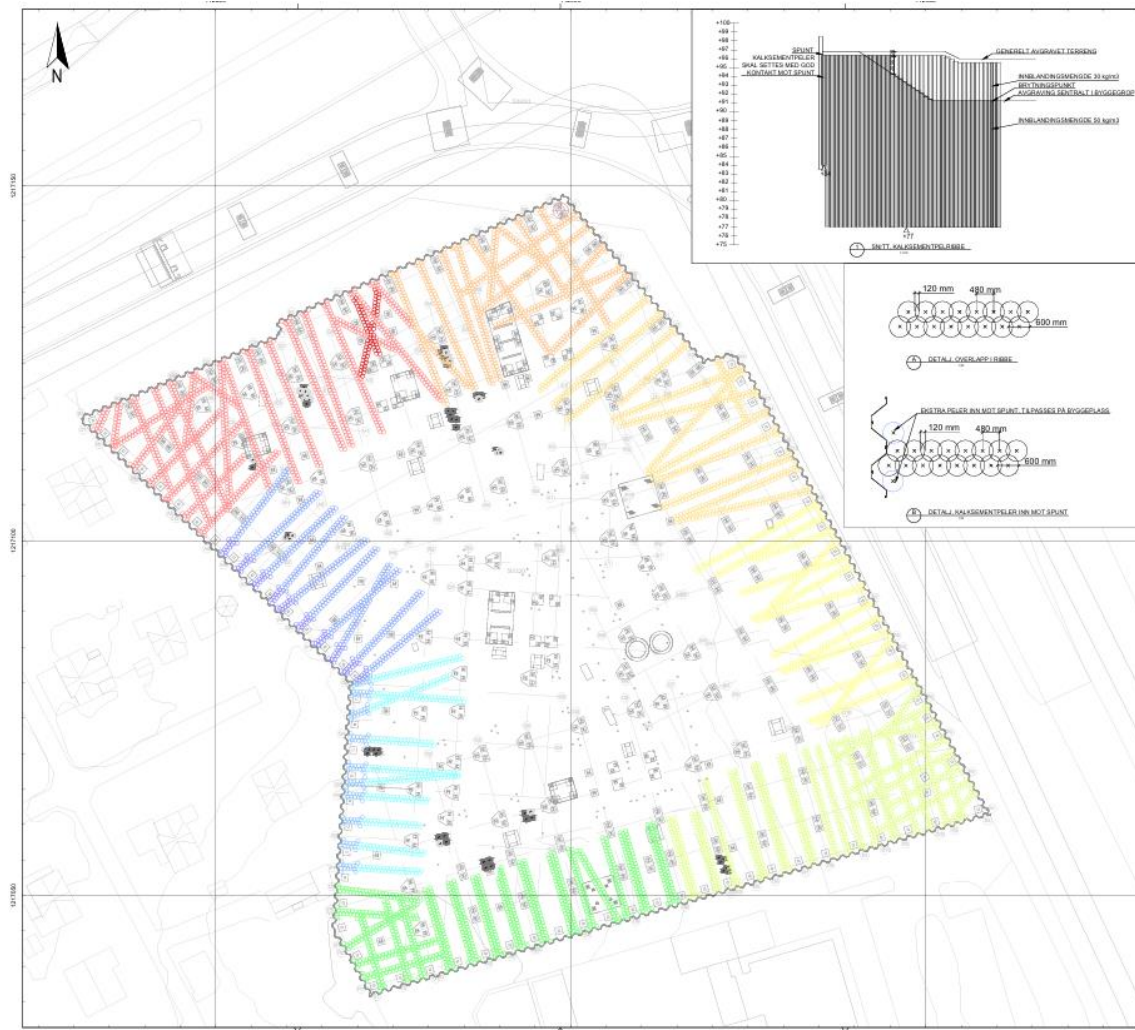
plan view of the building pit with the location of Sheet pile walls in black and in different colours the location of the lime-cement stabilization (NGI report)
